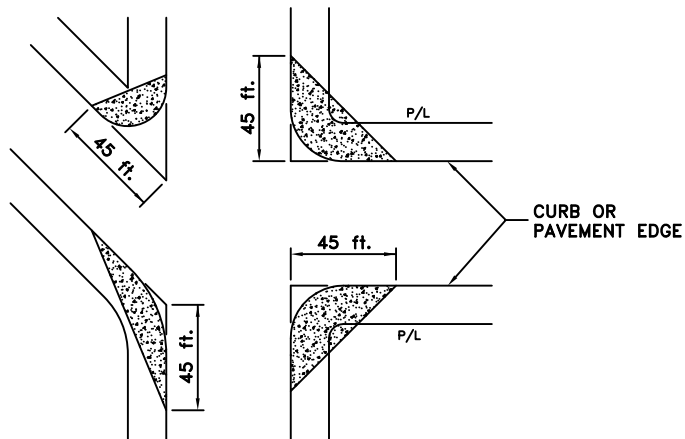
VISIBILITY OBSTRUCTIONS DRIVEWAYS AND INTERSECTIONS
